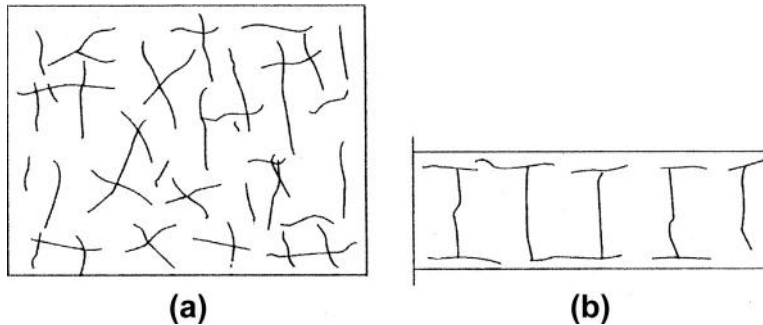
Cracks caused by shrinkage of concrete: (a) on surface of slab, (b) outside of reinforcements
